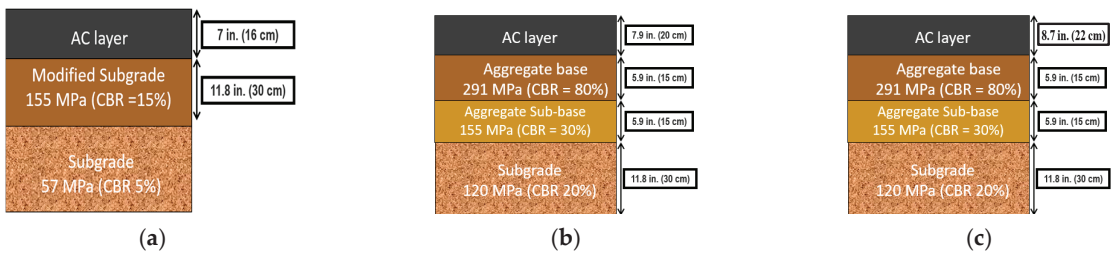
Pavement structure used in ME analysis. (a) Typical sections constructed before 2012 in Kuwait, (b) AASHTO 93 pavement structure, and (c) FlexPave™ pavement structure.
